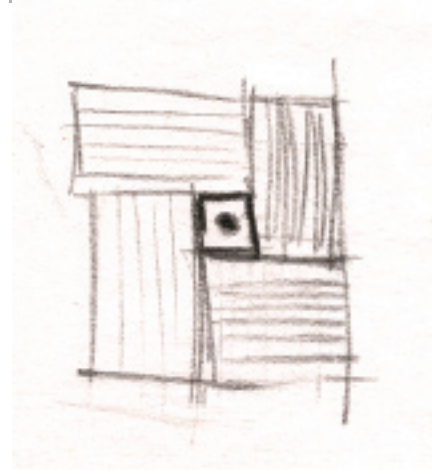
Concrete pier and railing concept. The pier must be able to allow for visitors to interface with the island if or when the sand shifts towards the pier. (source: S. Ridgely)
